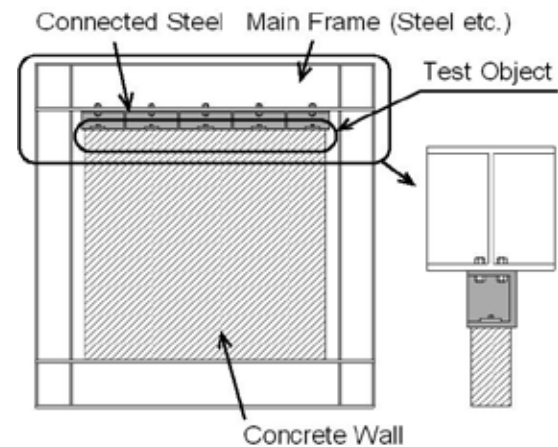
Overview of the Proposed Frictional Connecting Method between Wall and Frame (2)
